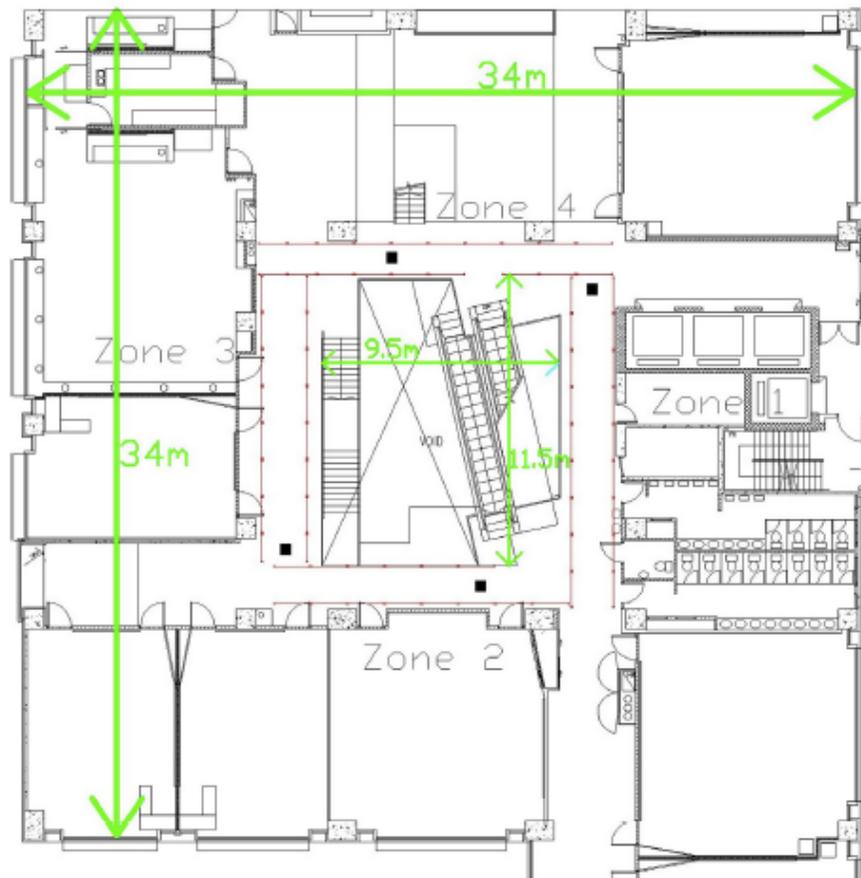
A plan of the photoelectric sensors located in the ninth floor
